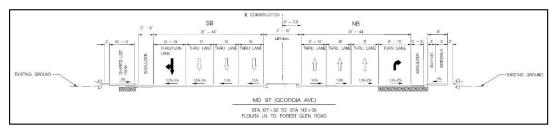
Proposed Typical Cross Section – Flora Lane to Forest Glen Road
